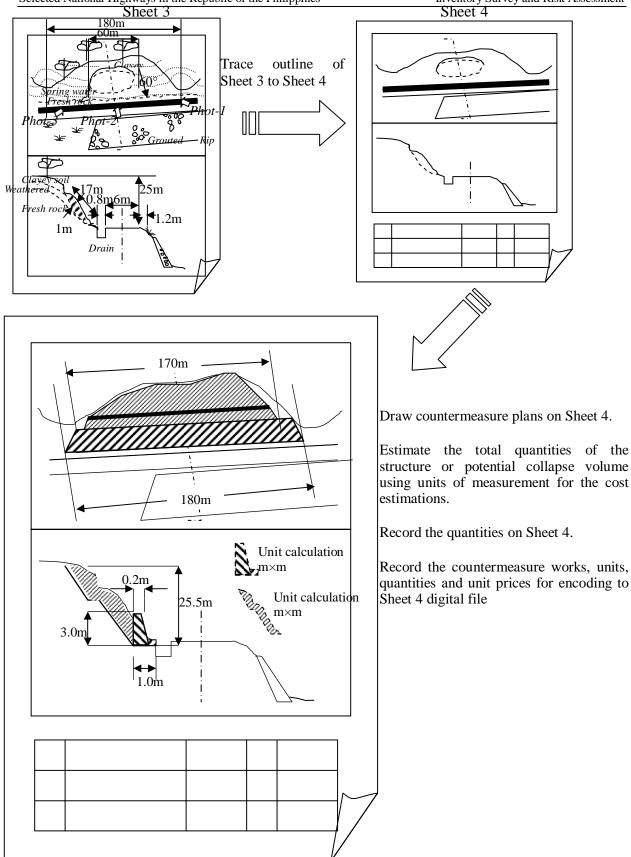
Procedure for Drawing Sheet 4 Countermeasure Plan
